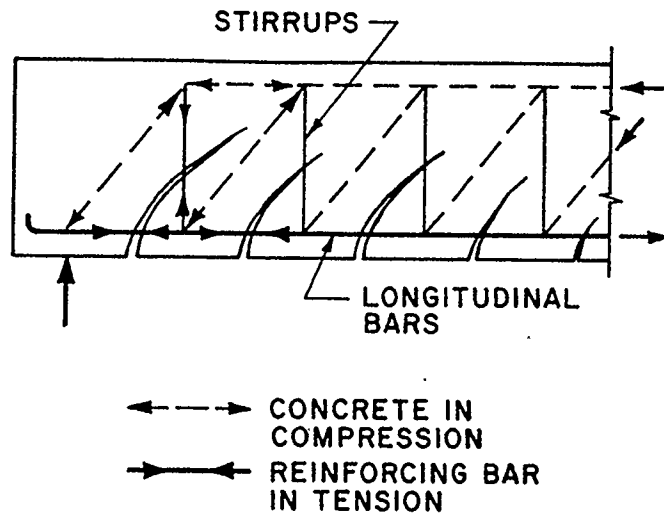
Truss Analogy (Pillai and Kirk, 1988)
